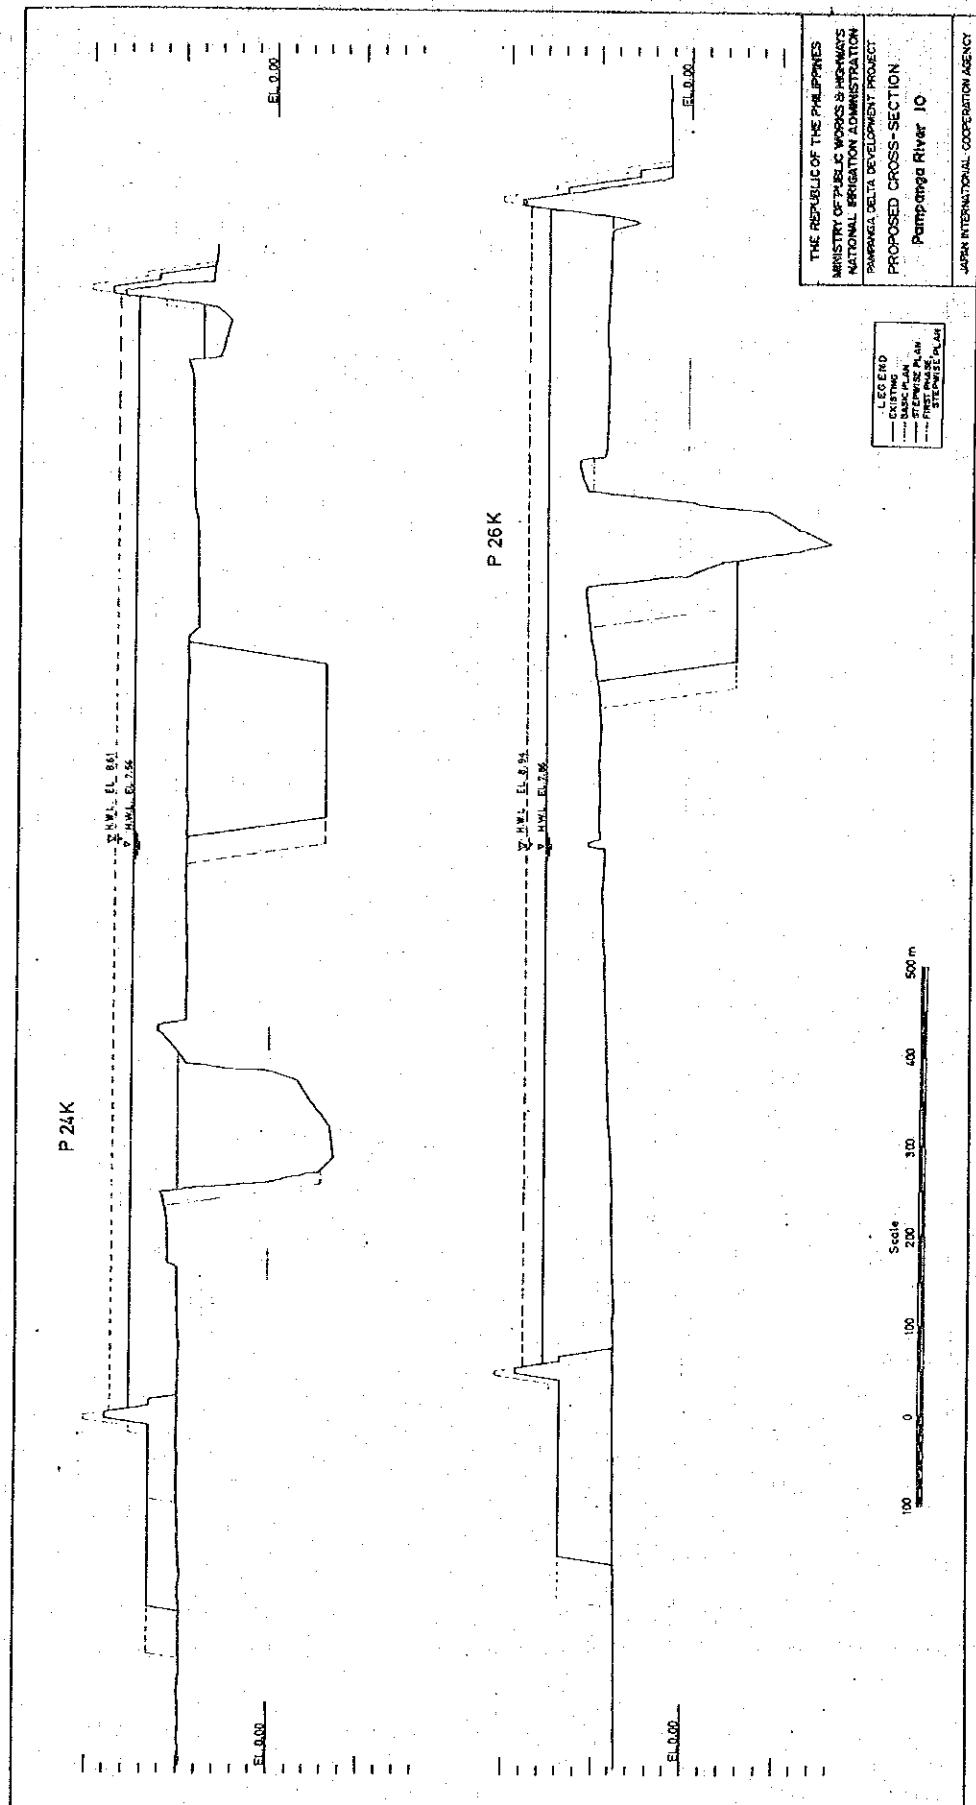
(11) PROPOSED CHANNEL CROSS-SECTION
